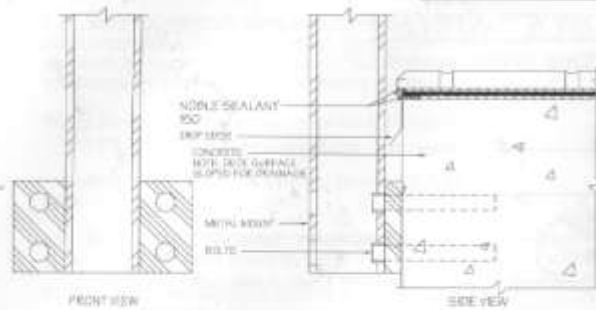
HAND RAIL MOUNTING DETAIL
